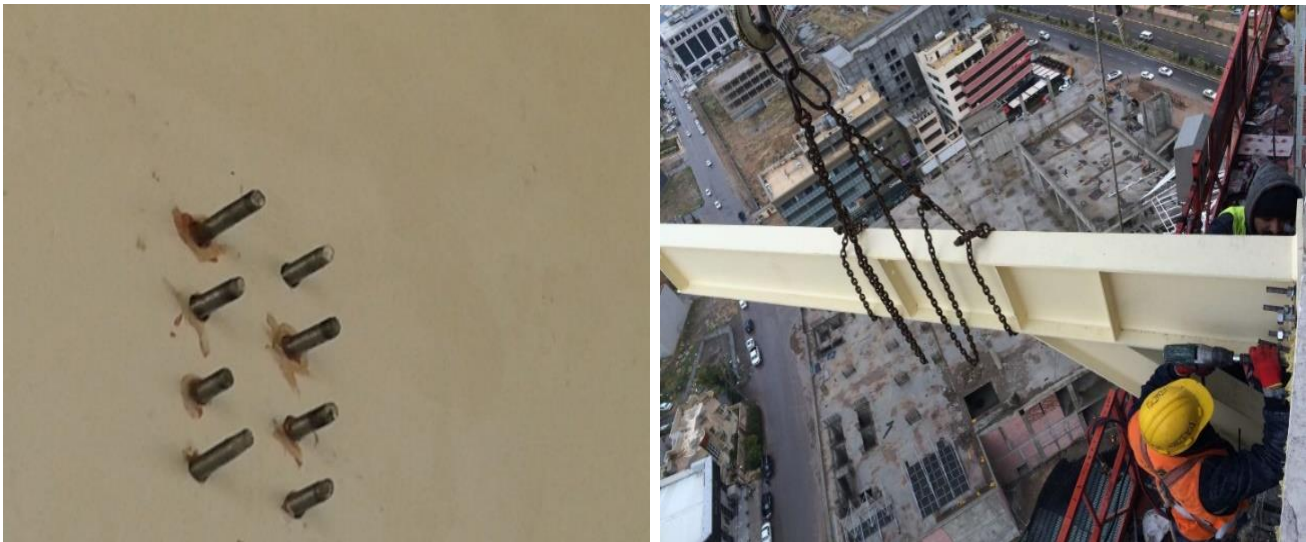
3 Gulan Tower, connecting new steel beams with existing reinforced column ,2014.
